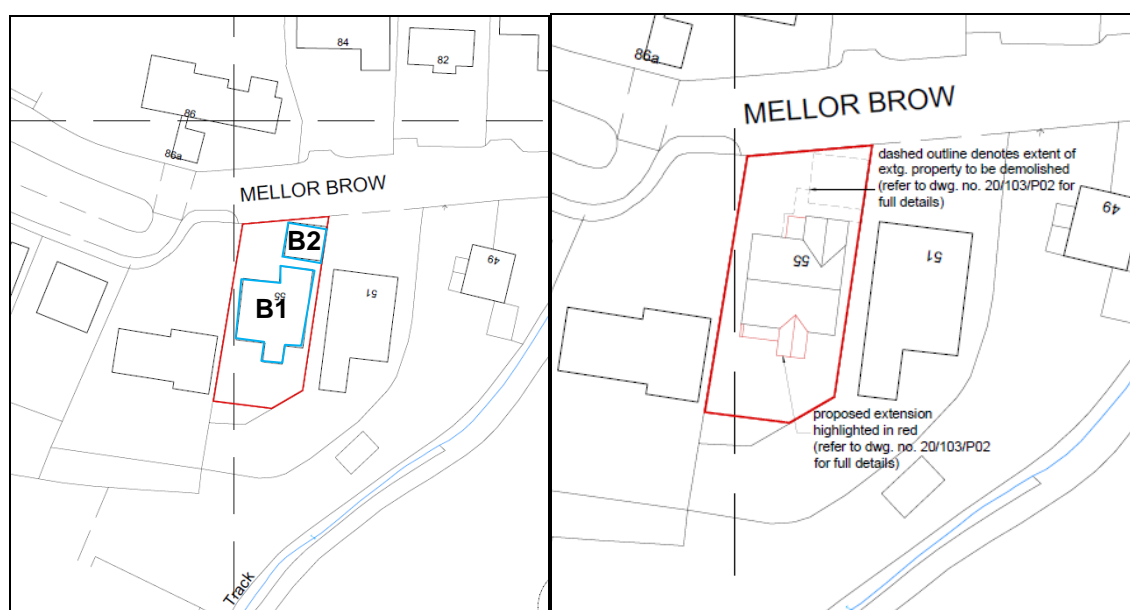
Location plan with positions of B1 and B2 (left) and proposed block plan (right) (LMP Architects)
